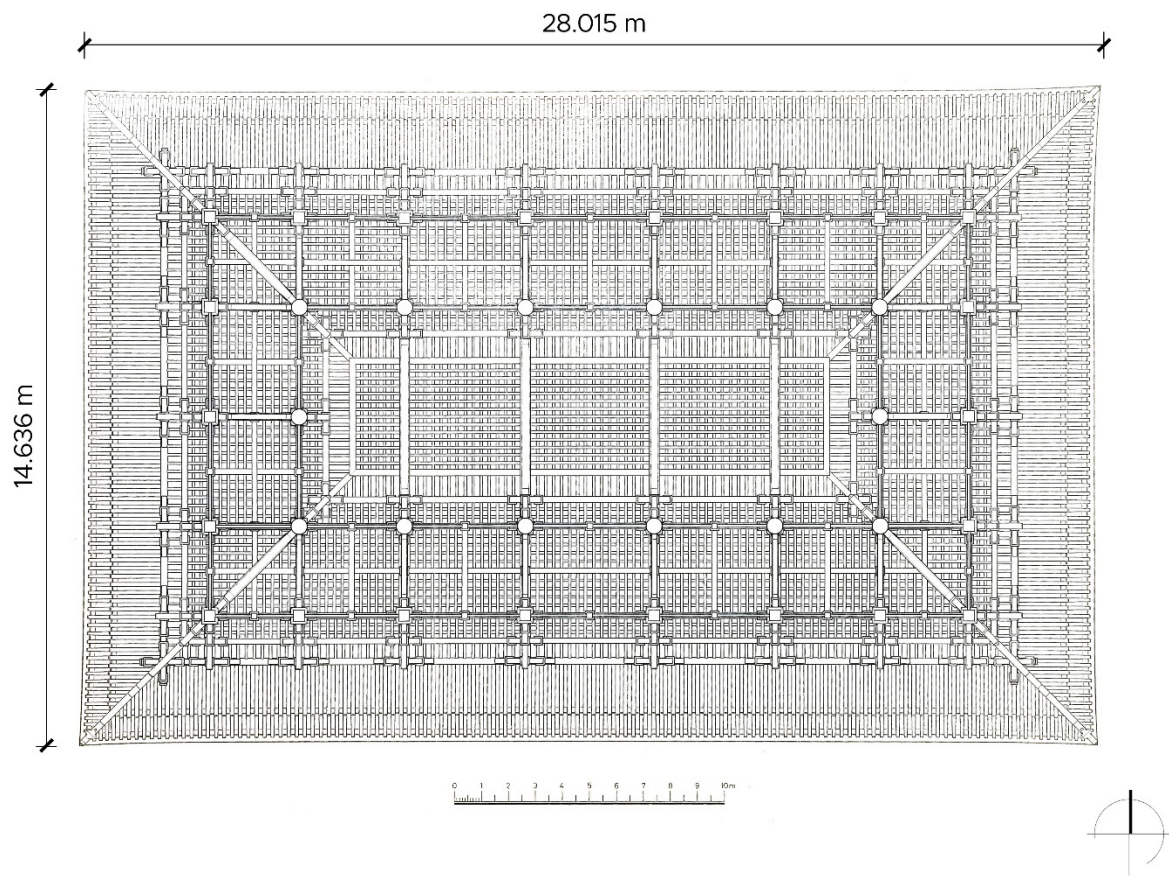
Roof Plan (Office of Cultural Assets Preservation, 2009)
